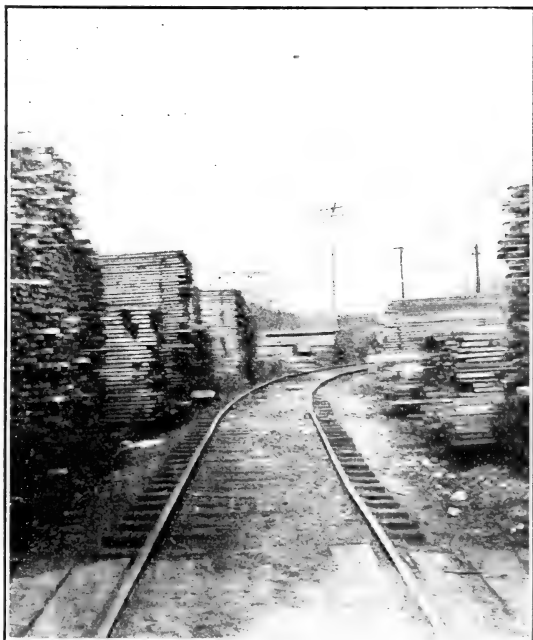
A clean, sanitary retail yard, having concrete foundations throughout and creosoted ties in the railroad track.
